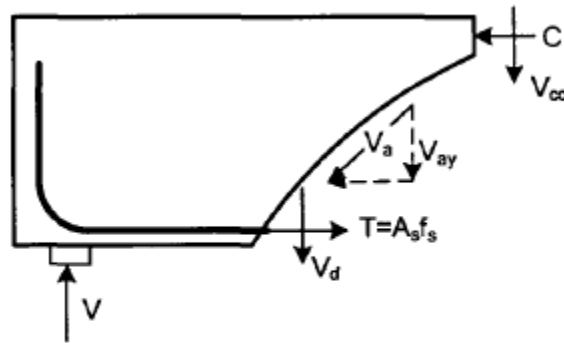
Shear Transfer Mechanisms in a Concrete Member without Transverse Reinforcement (Dinh, 2009)
